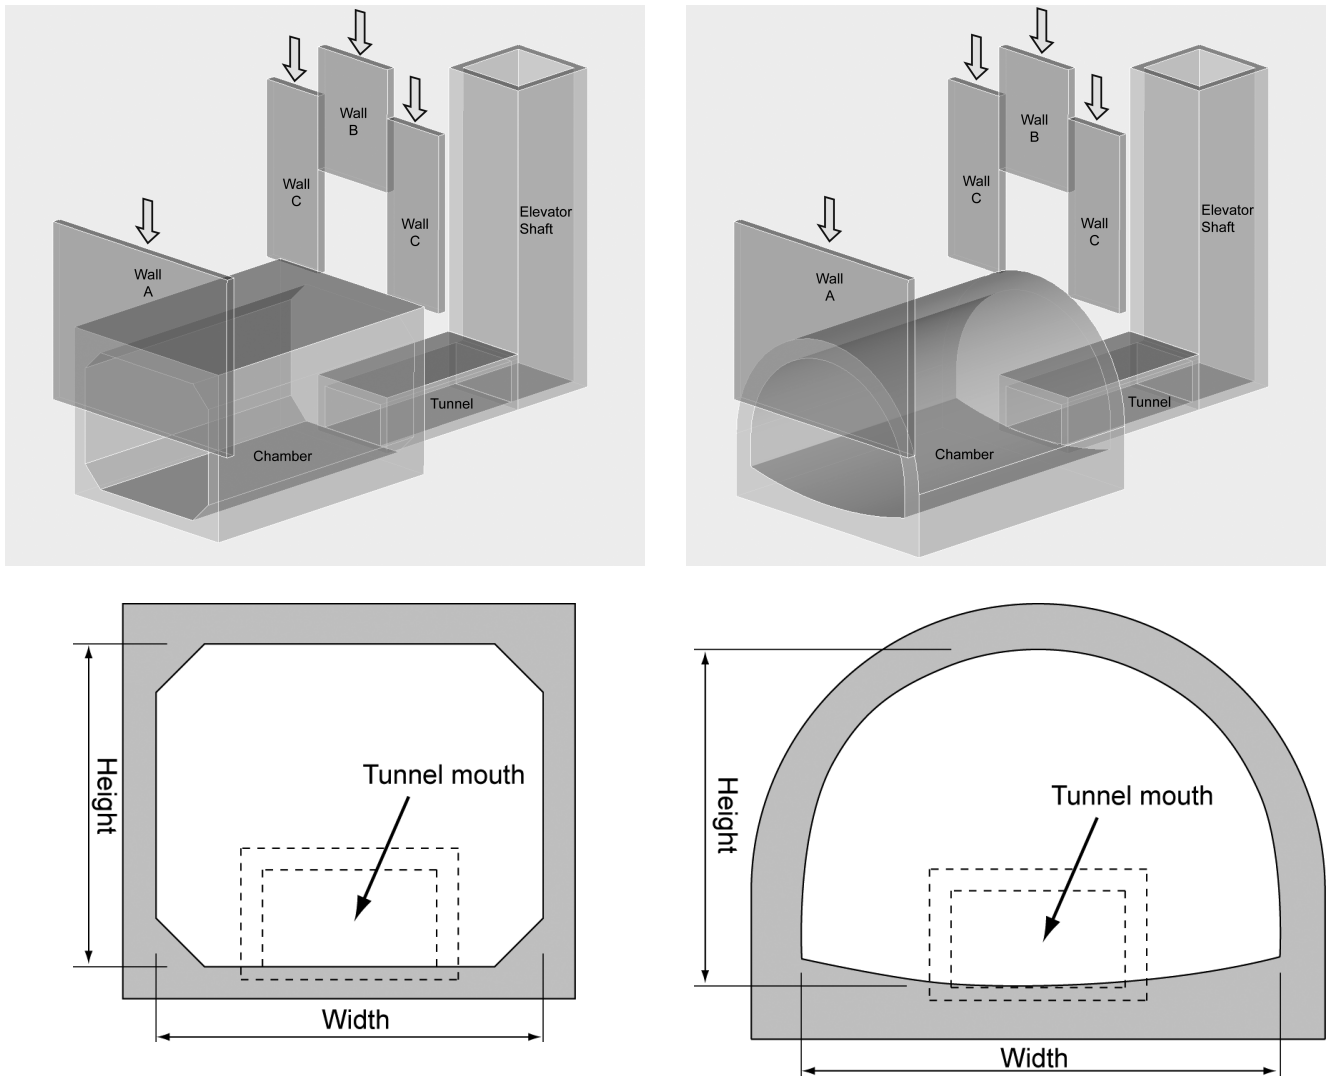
Schematic drawings of the box-shaped (left) and arch-shaped (right) storage chambers with culvert structures.
